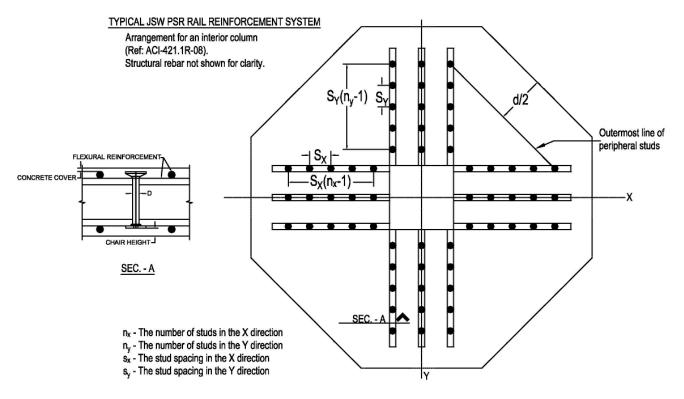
TYPICAL JSW STUD RAILS REINFORCEMENT SYSTEM DETAILS
